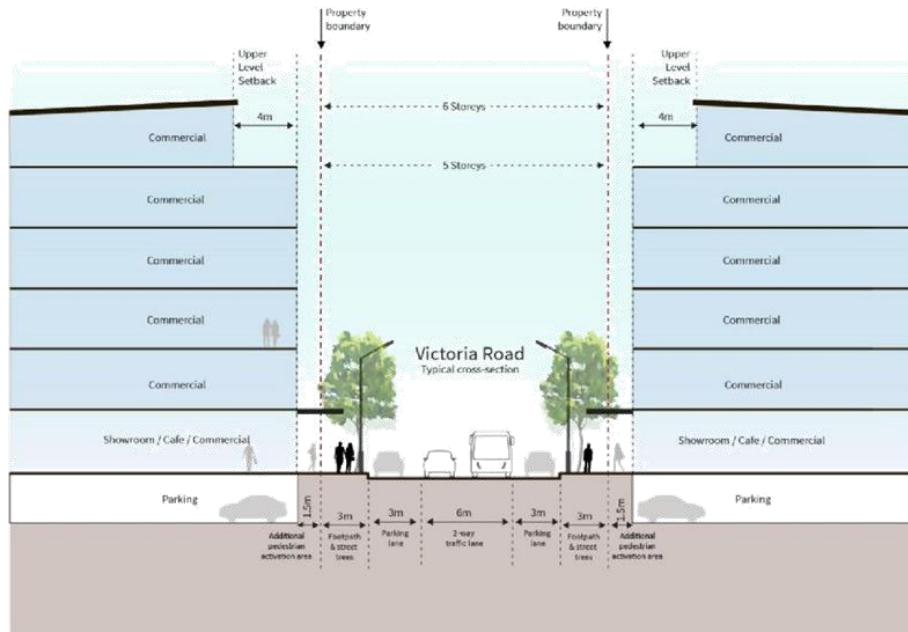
Street section 2 - Victoria Road (B5 Business Development zone)
